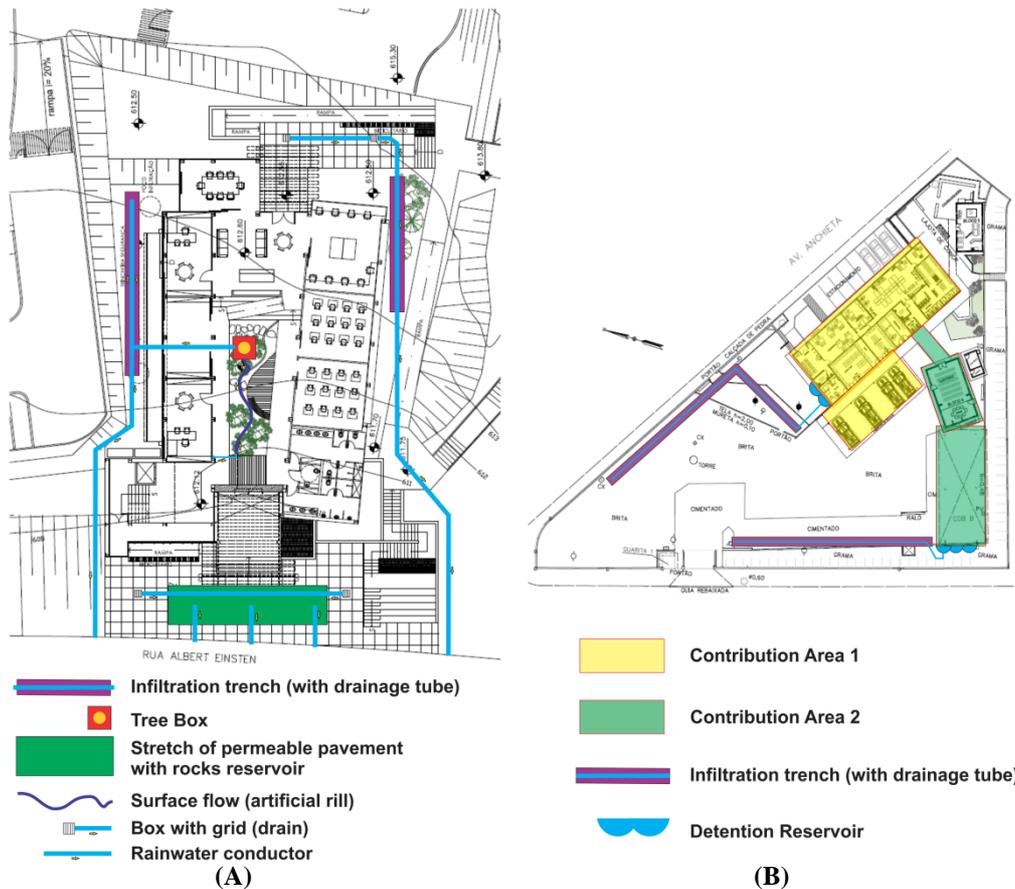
Schemes of source drainage systems simulated in (A) laboratory - building to be constructed and in (B) commercial building - existing.
